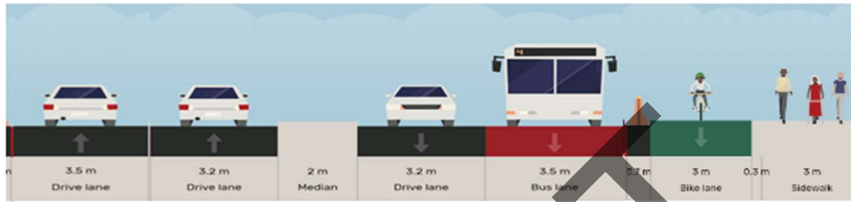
Option 2 – Thorndon Quay Indicative Plan and Cross Section
